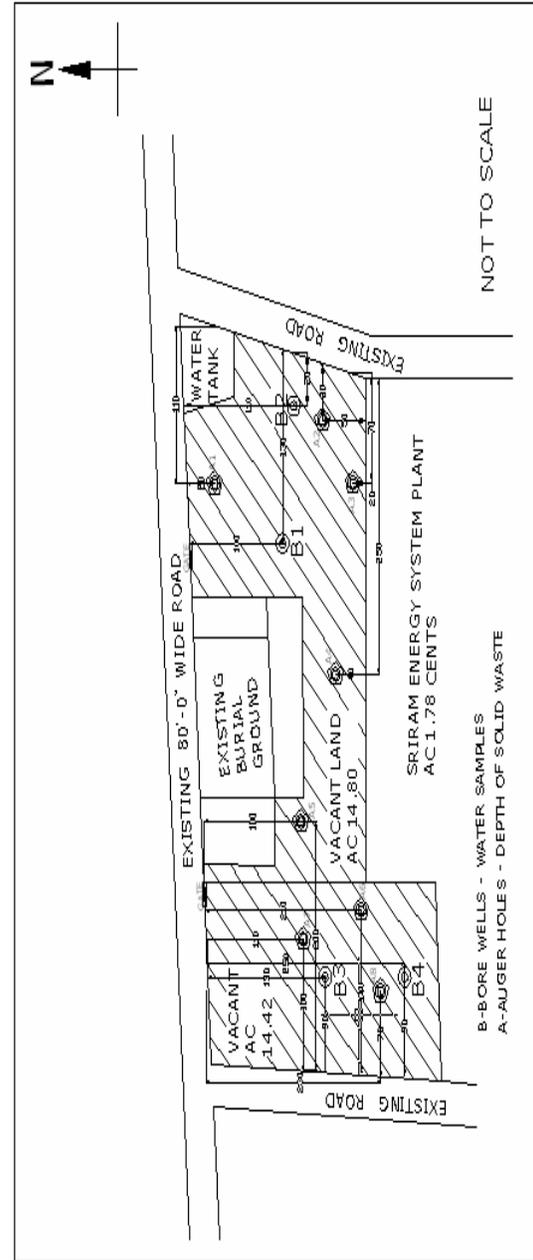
Proposed site plan - Showing the Ground Water Sampling Wells and Auger holes
